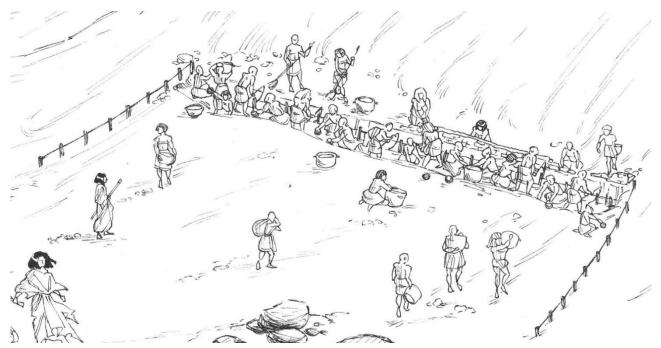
Artist's reconstruction of the commencement of work on TT 71 - 30 men outlining the façade of the tomb by excavating a predefined groove or ditch (the task of h33.t) and building the upper retaining wall of the portico. Illustration by Ida Christensen.
